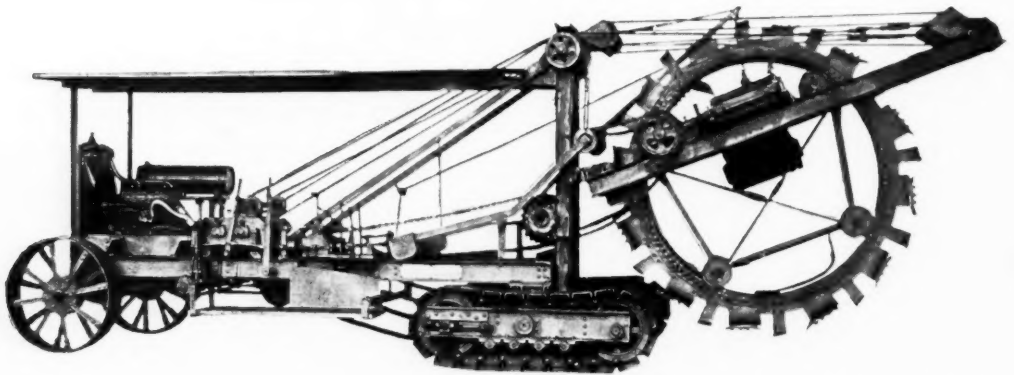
A Wheel Type Trenching Machine showing general construction details. This machine is propelled and operated by an internal combustion engine.
